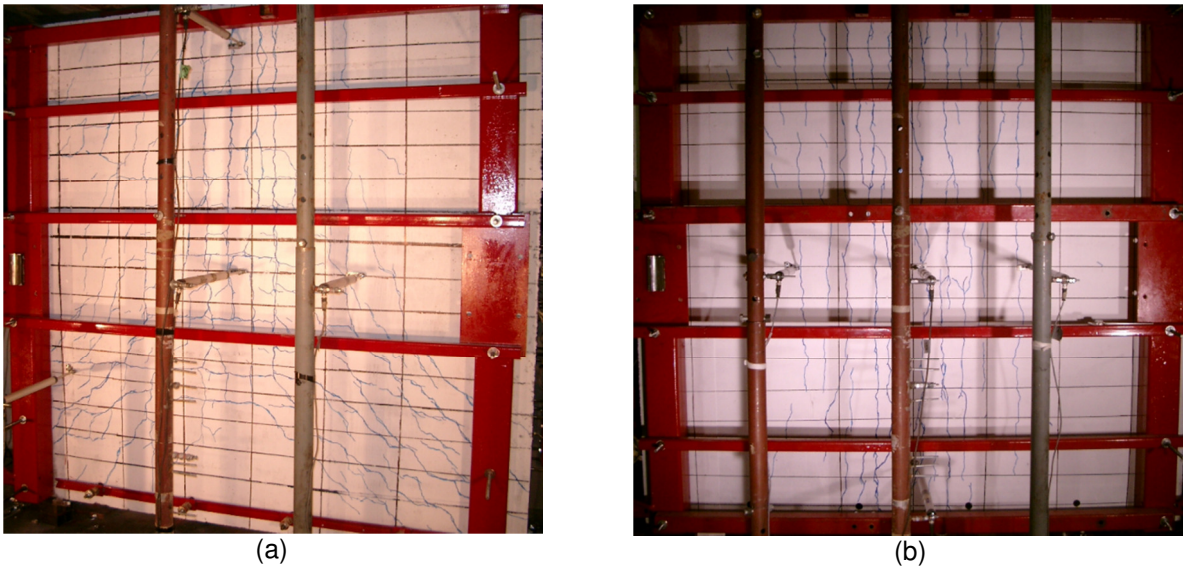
Condition of Walls after Test 6: (a) Wall 1; and (b) Wall 2
